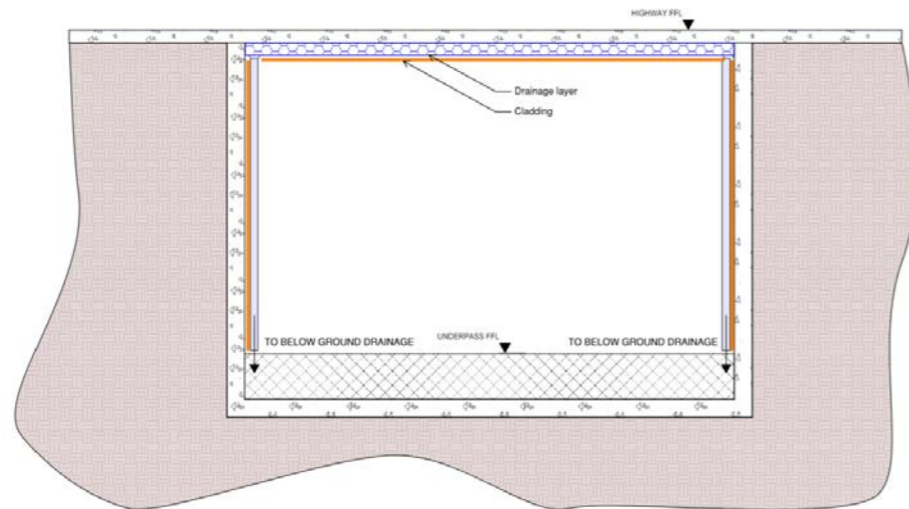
Conceptual sketch of drainage layer to highway soffit
